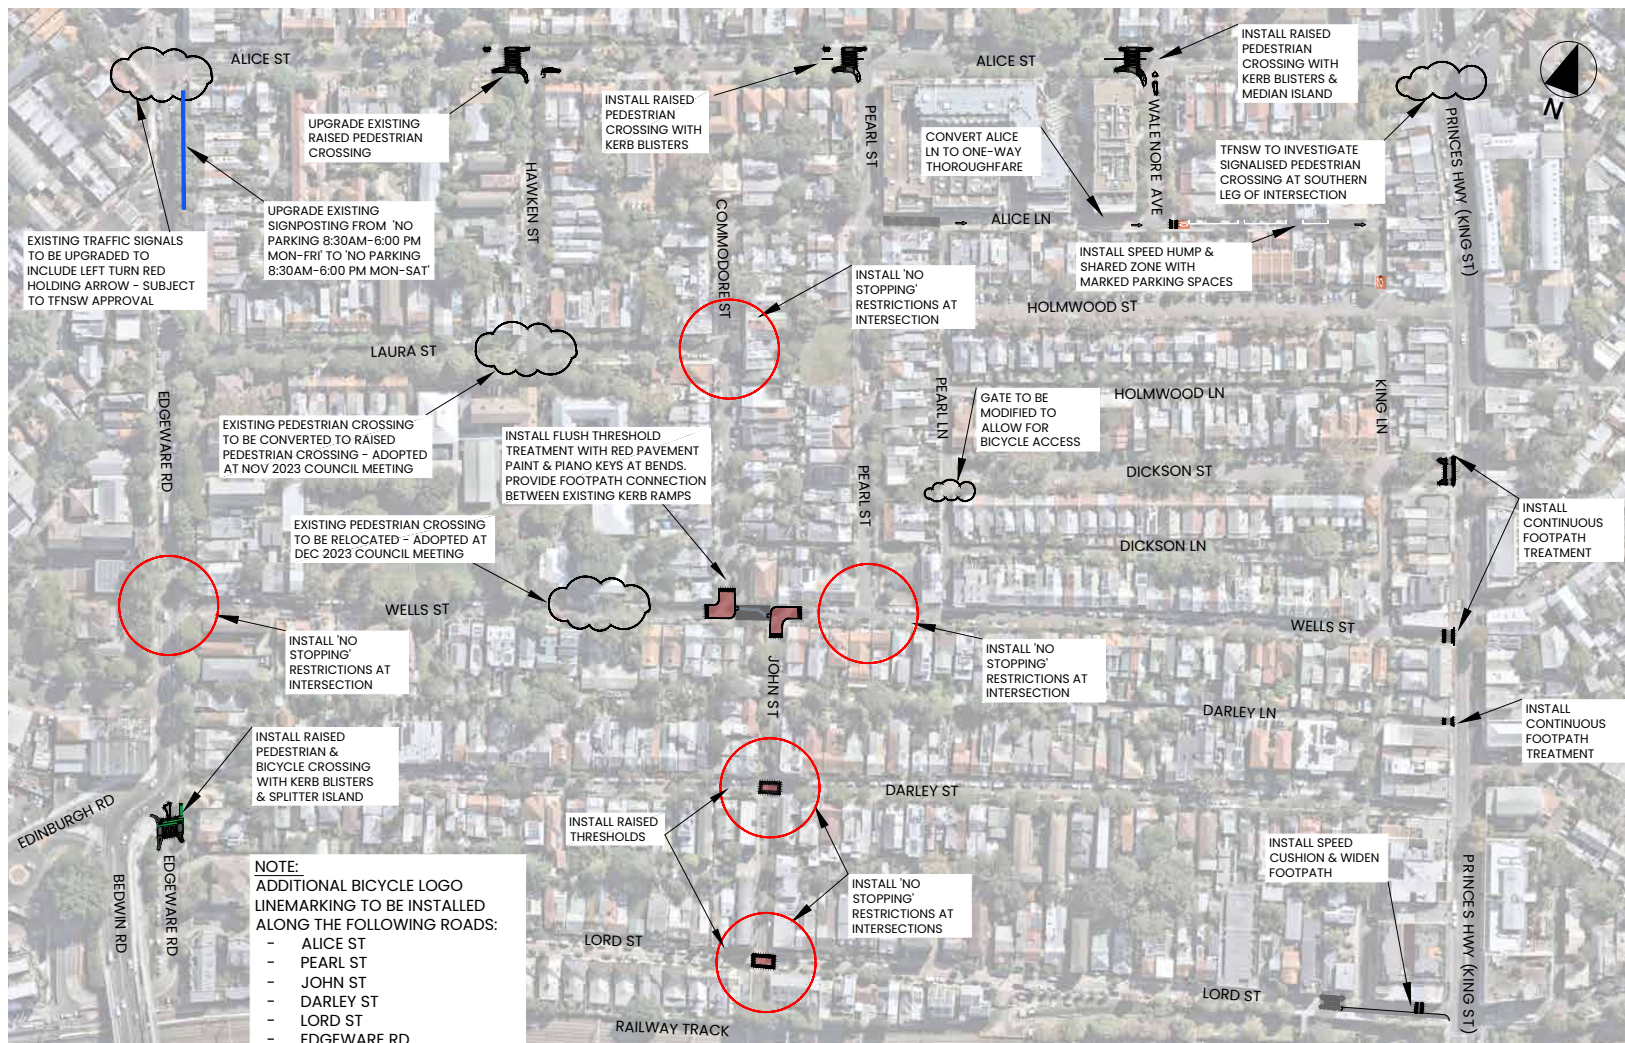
Overall Plan of Proposed Treatments placed on Public Exhibition.
